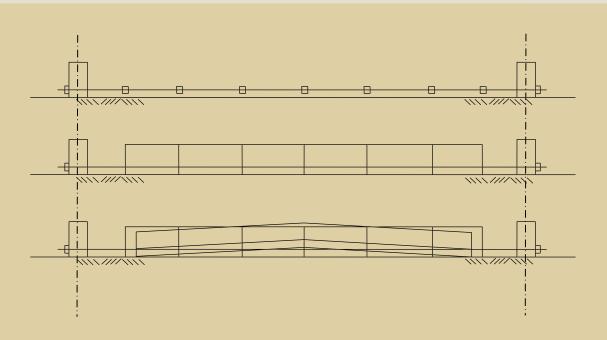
The fabrication sequence for pretensioning a curved precast concrete girder is the same as for straight girders. Note: The drawing is not to scale, and the camber is exaggerated.
